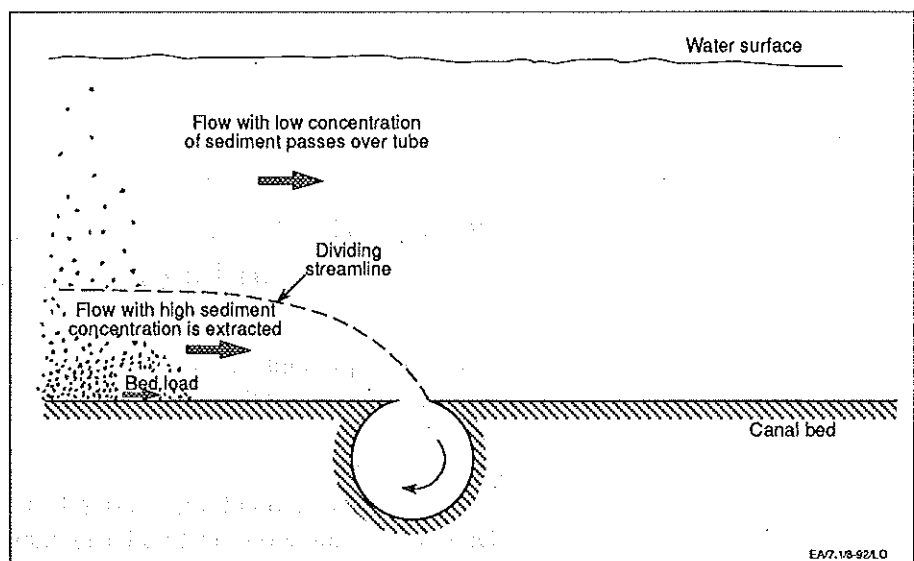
Section of a vortex tube sediment extractor with one tube
